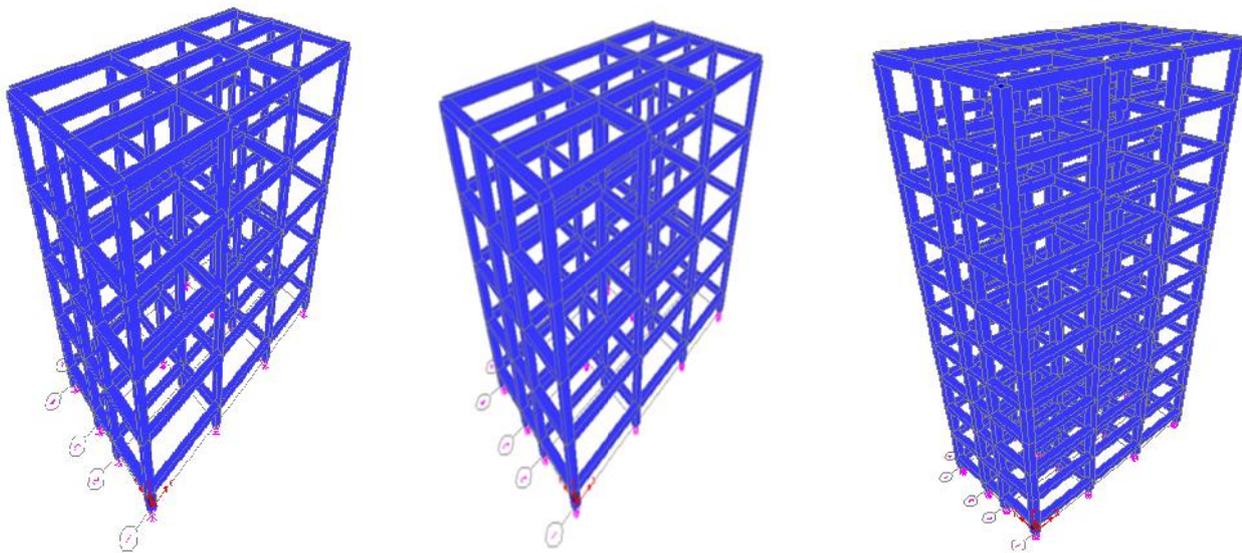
3D view of rubber bearing building (G+3) in SAP, Fig 8: 3D view of friction isolator building (G+3) in SAP, Fig 9: 3D view of rubber bearing building (G+9) in SAP
